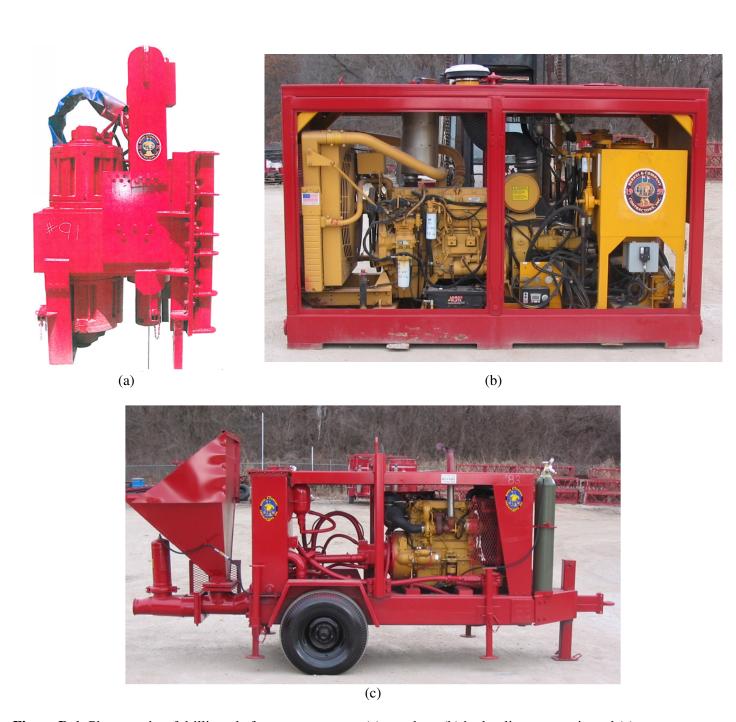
Photographs of drilling platform components: (a) gear box, (b) hydraulic power unit, and (c) grout pump
